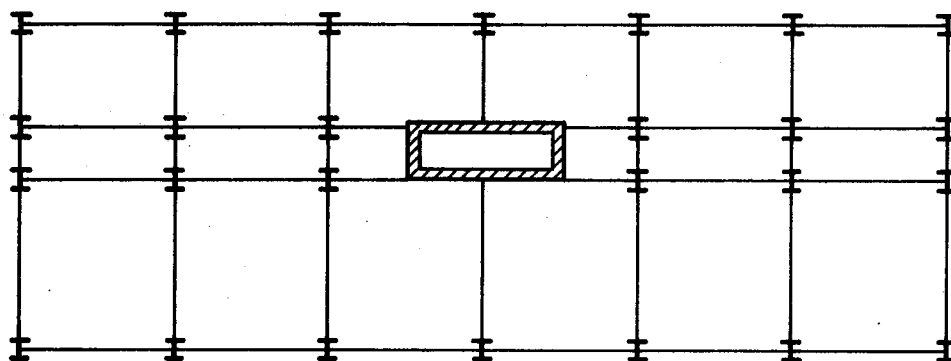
PLAN OF TYPICAL FRAME-SHEAR WALL STRUCTURE
